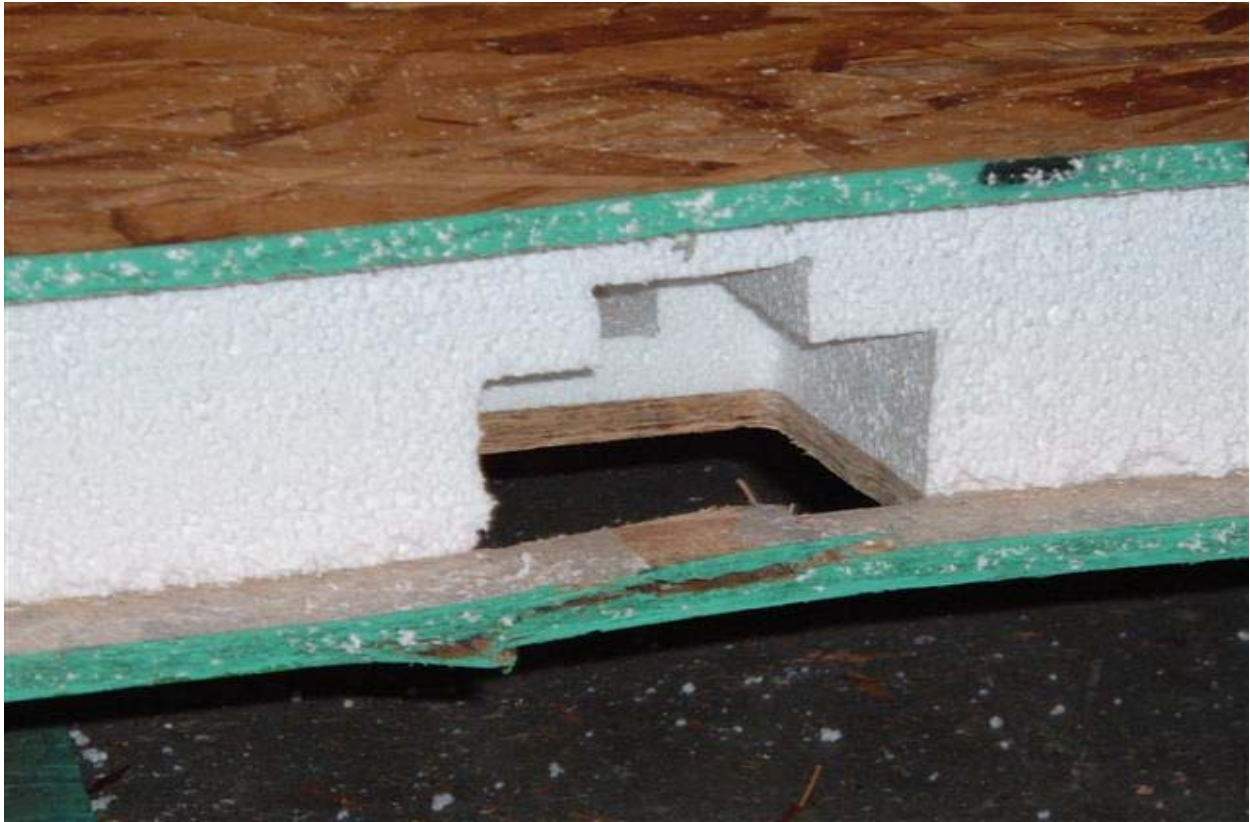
LINTEL LOAD TEST ASSEMBLY – END VIEW
